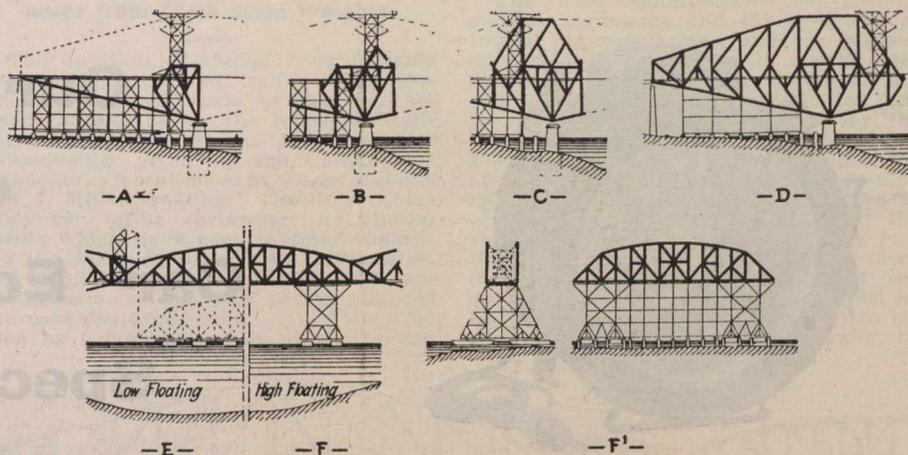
Quebec Bridge. Scheme of erection, St. Lawrence Bridge Co., Board's Design.
